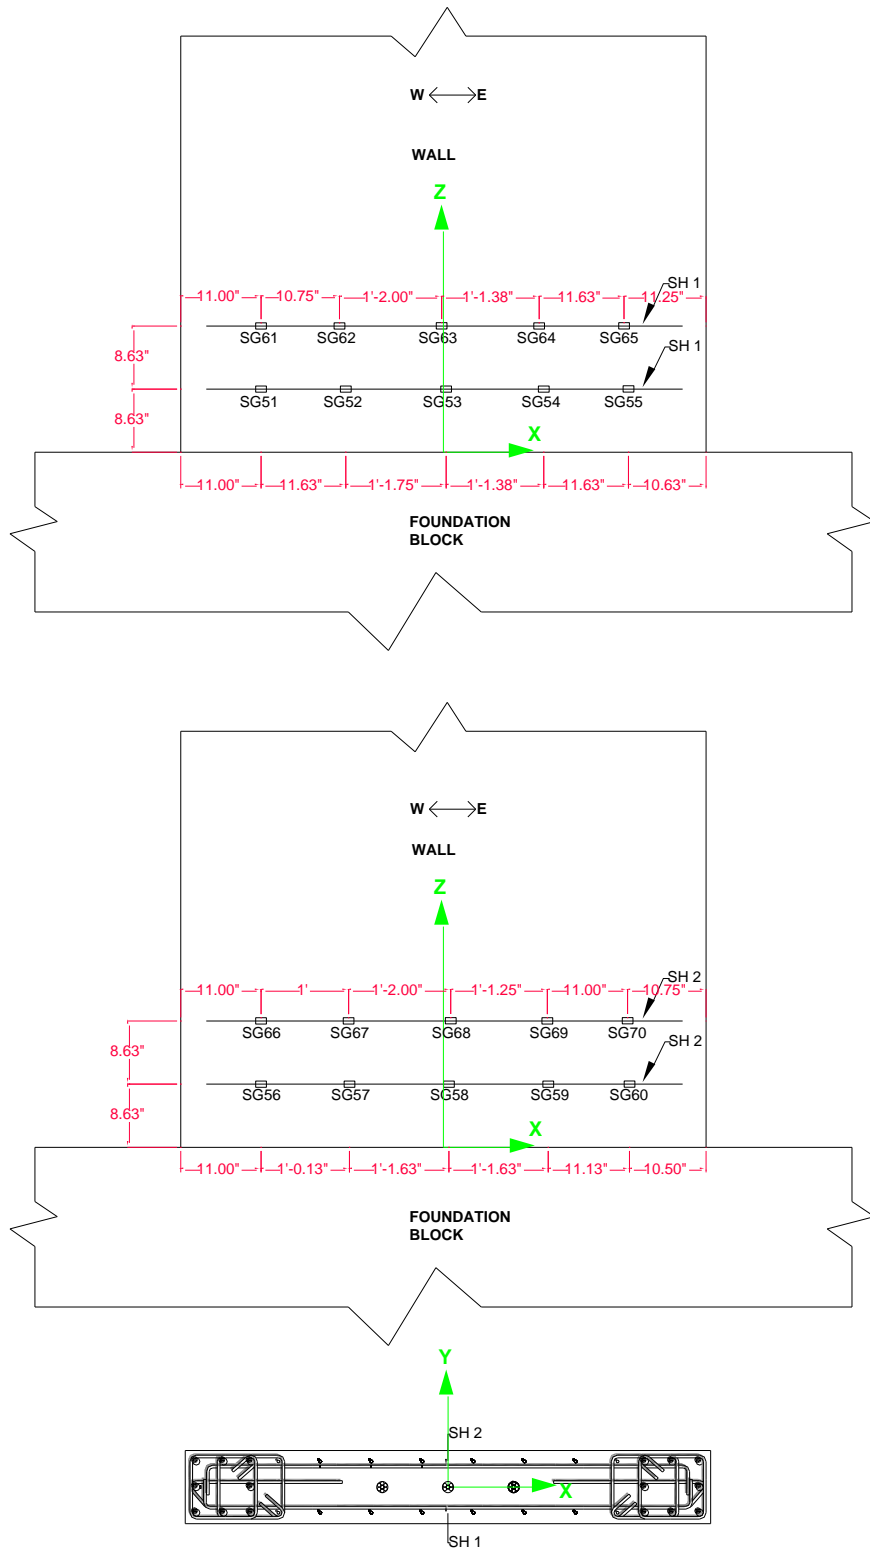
Strain gauges on web transverse steel reinforcement on Wall 2
